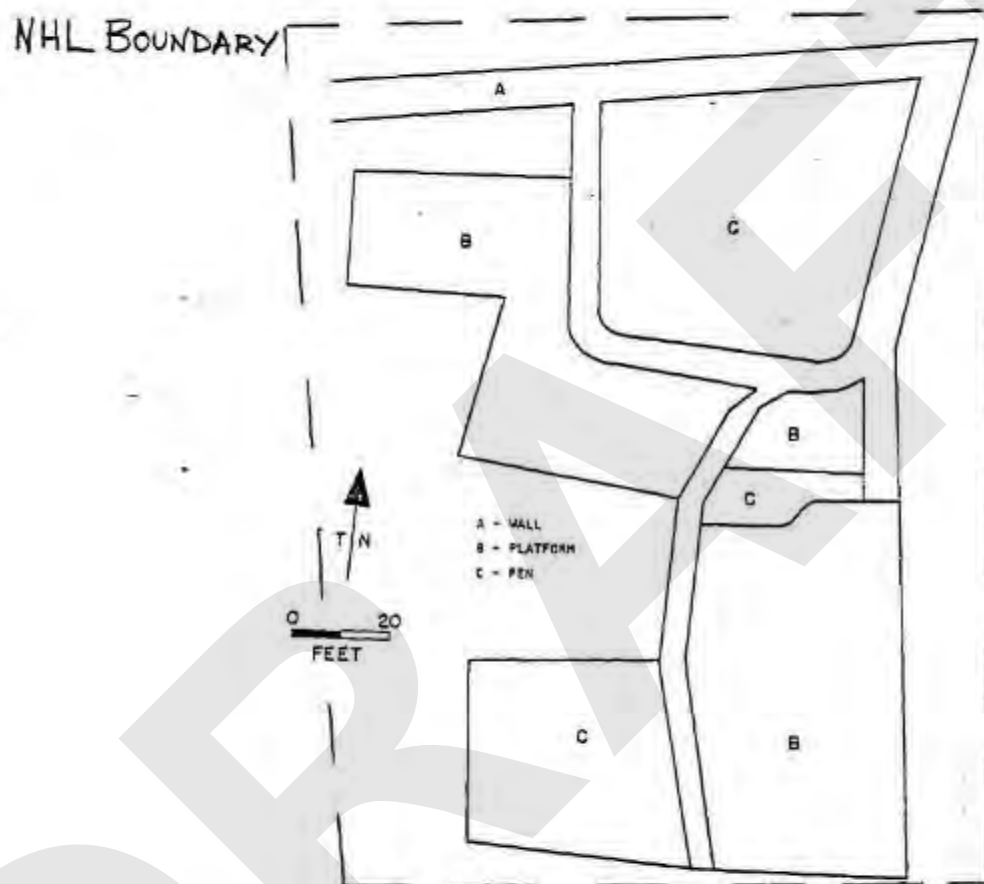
Plan of Kukui Heiau (Plan by Stokes, 1909)
